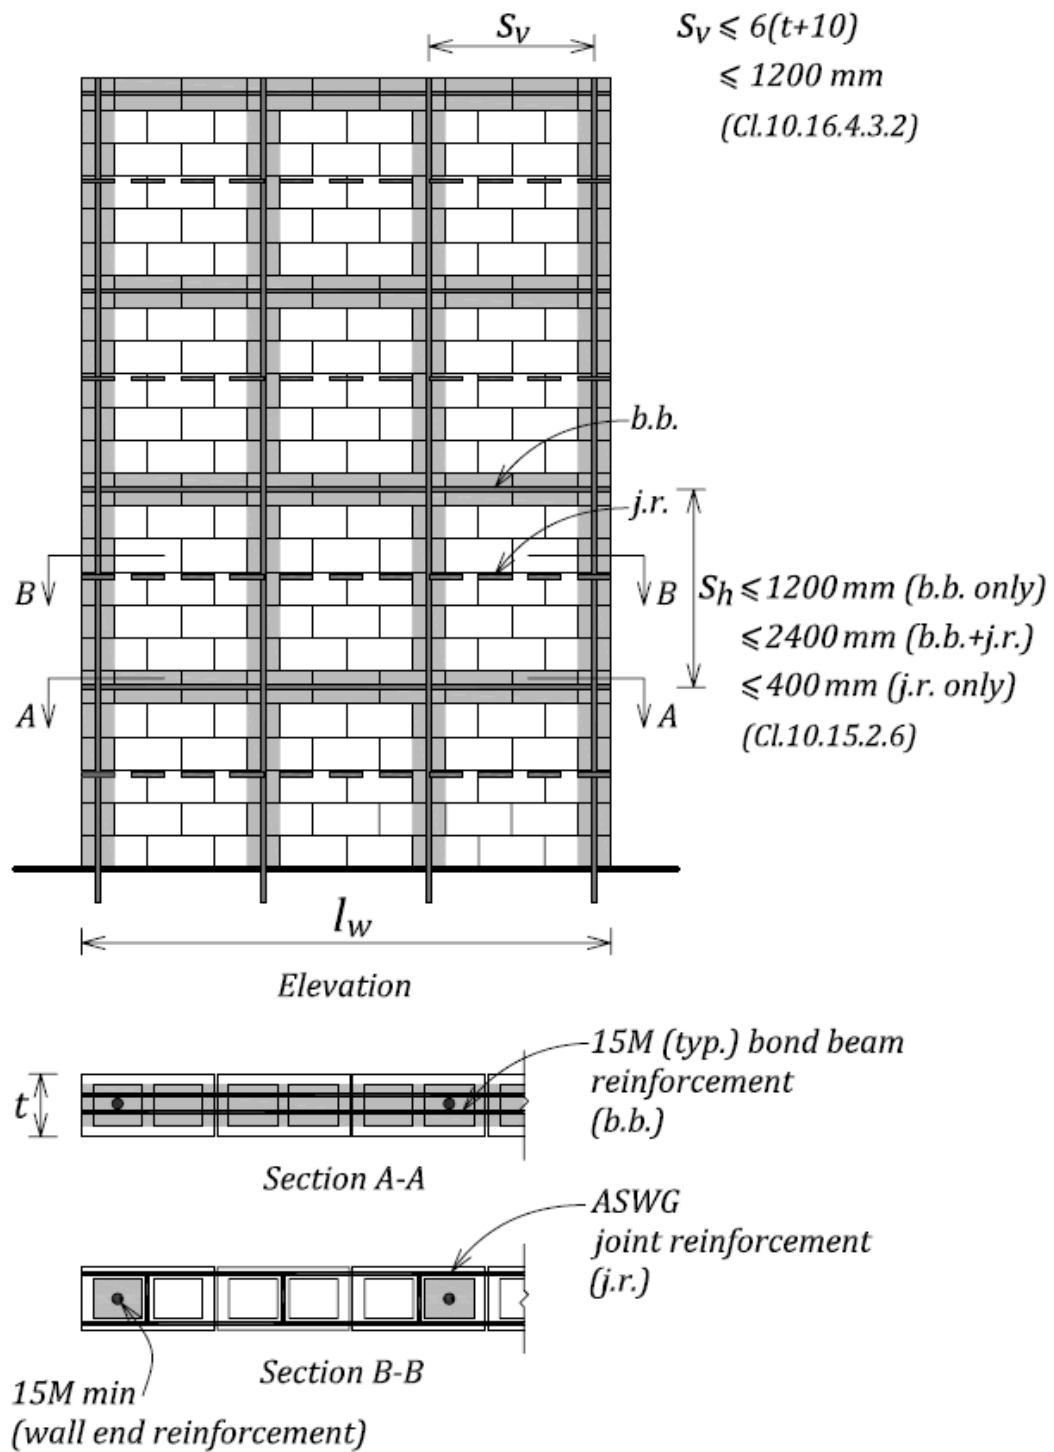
Reinforced masonry shear walls: CSA S304.1 minimum seismic reinforcement requirements.
